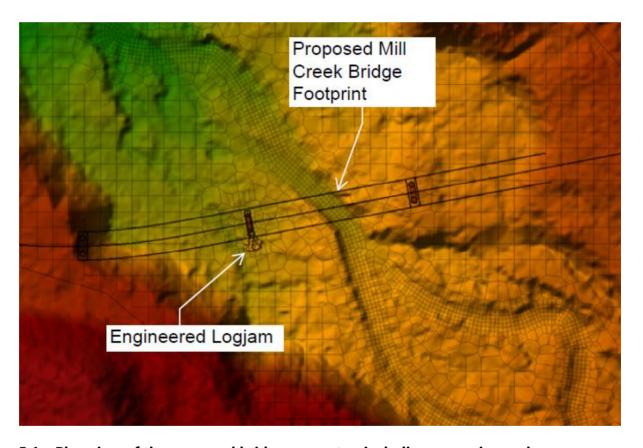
Plan view of the proposed bridge geometry, including an engineered logjam at the left pier.
